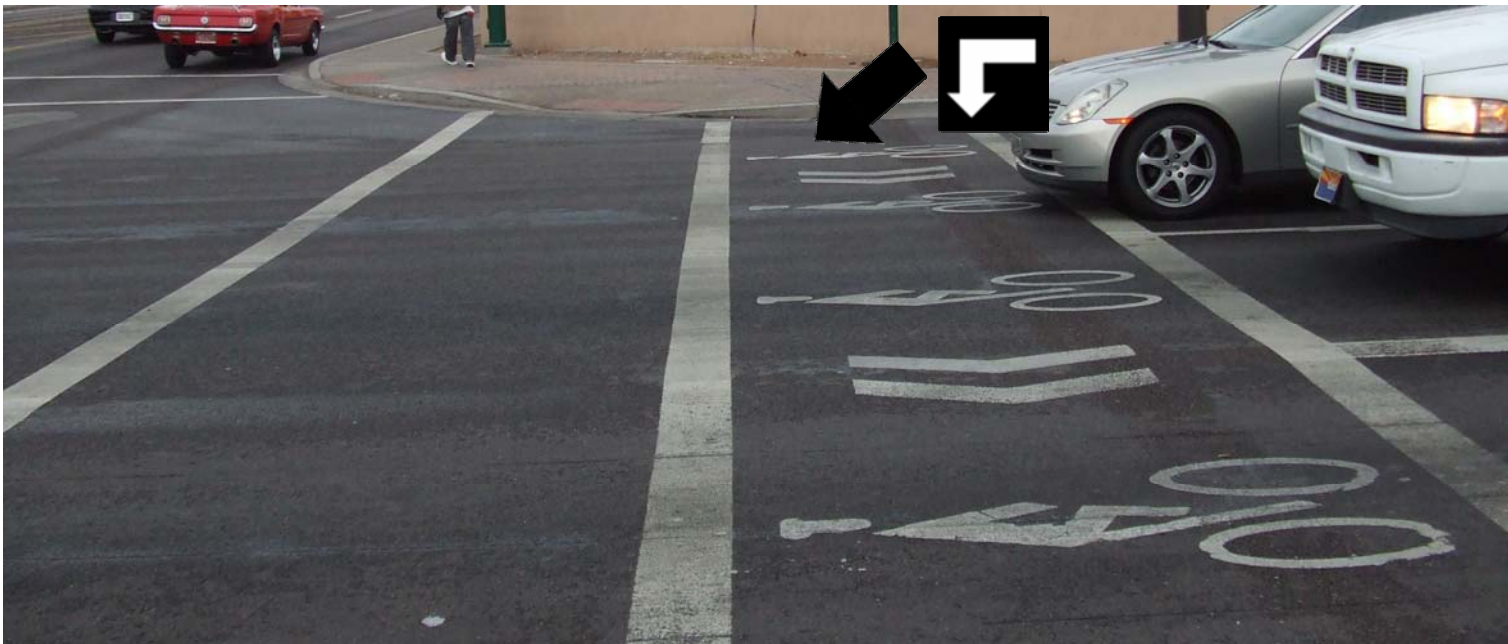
24<sup>th</sup> Street and Washington Street – Recommended Traffic Control
